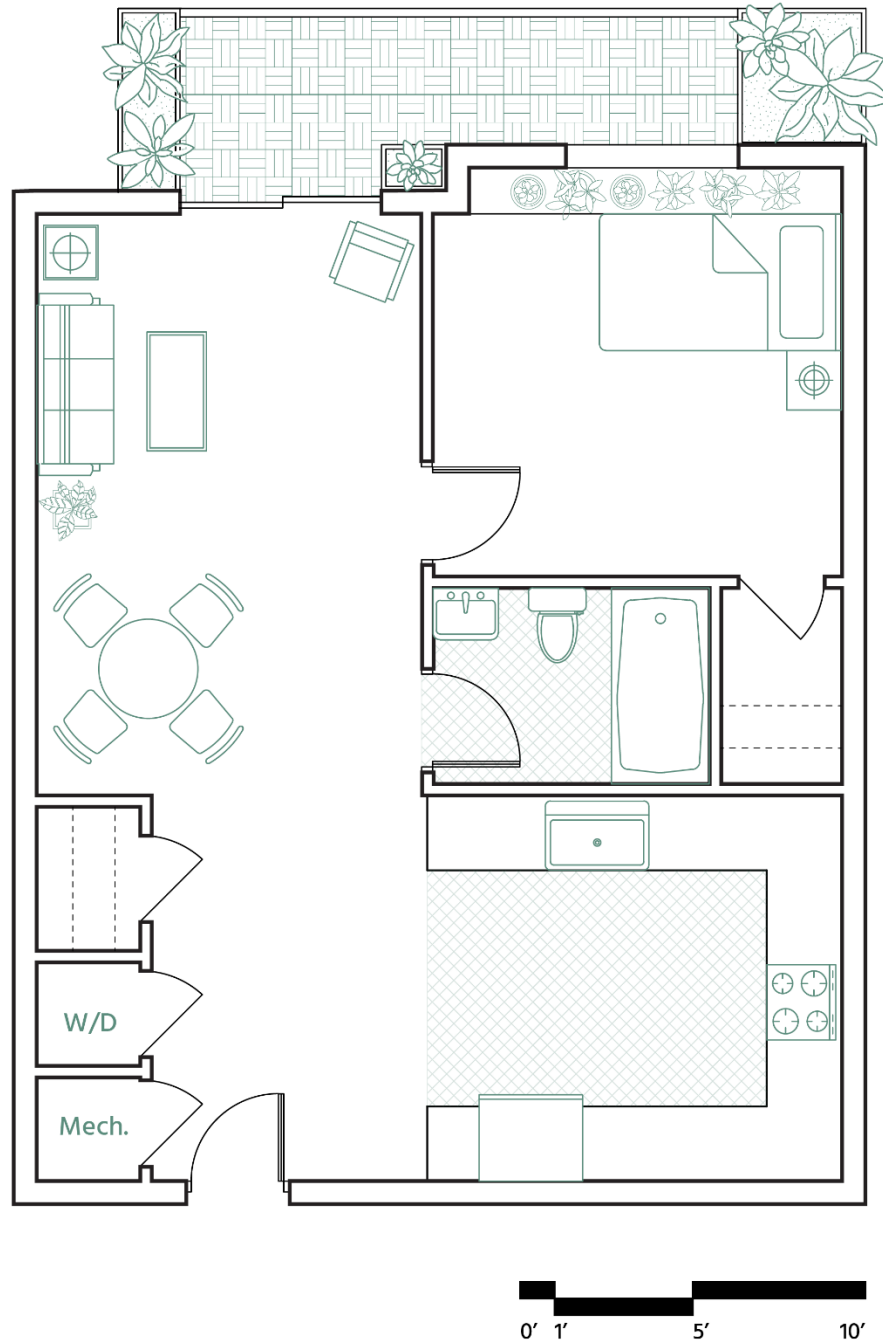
Typical 1-Bedroom Unit Plan (Source: Author)
